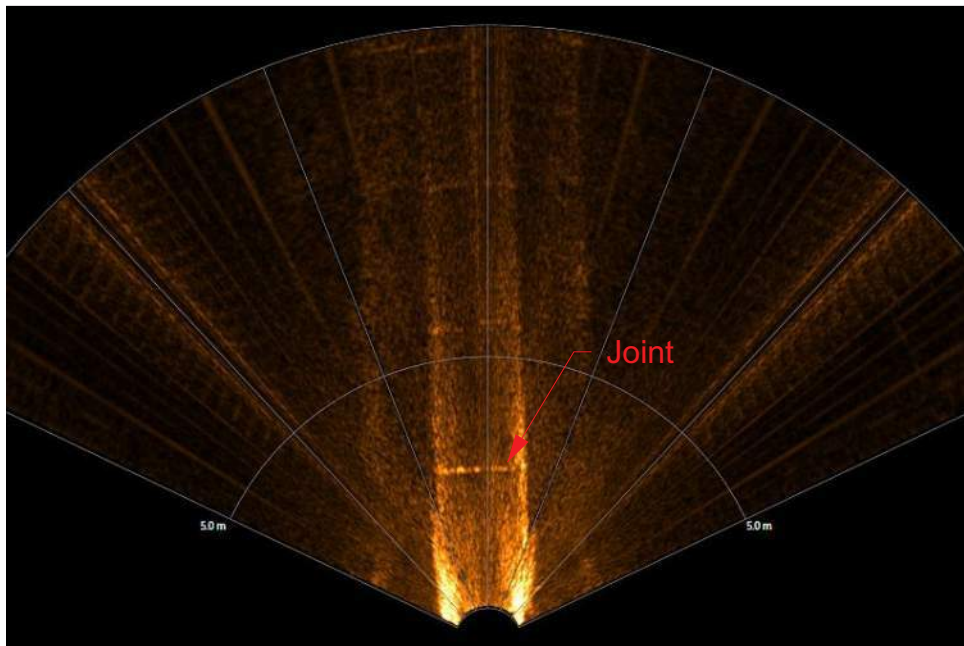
A-6: Sonar image at 146 feet downstream of Manhole 1. Joint spacing visible on sonar.
